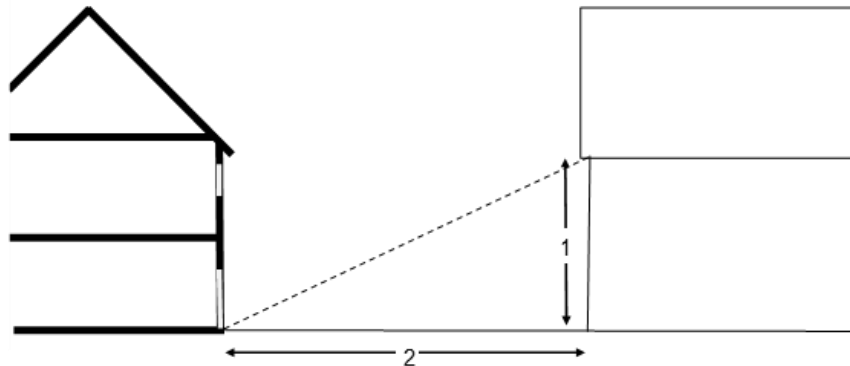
The distance between habitable room windows and a blank wall must be a minimum of twice the height of the wall.
